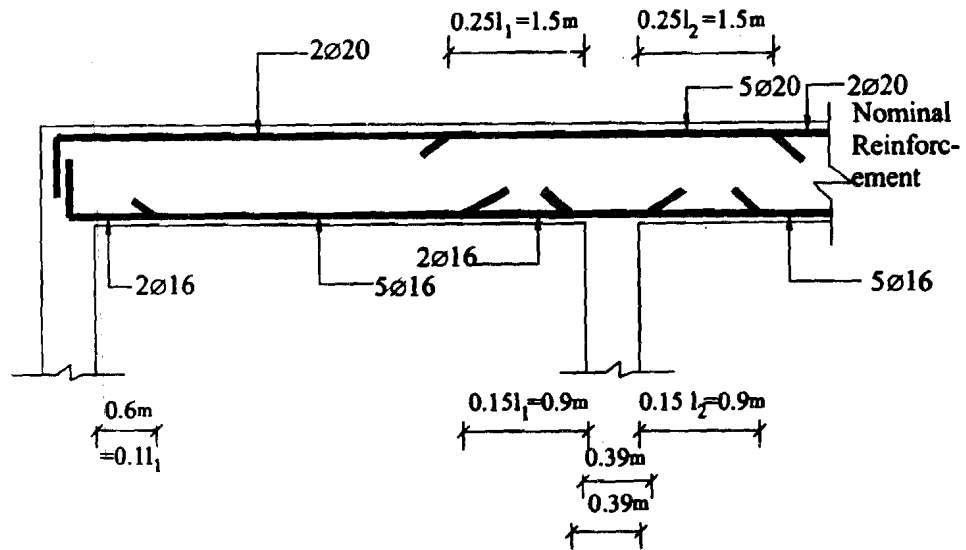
Reinforcement Detailing for the Designed Beam
